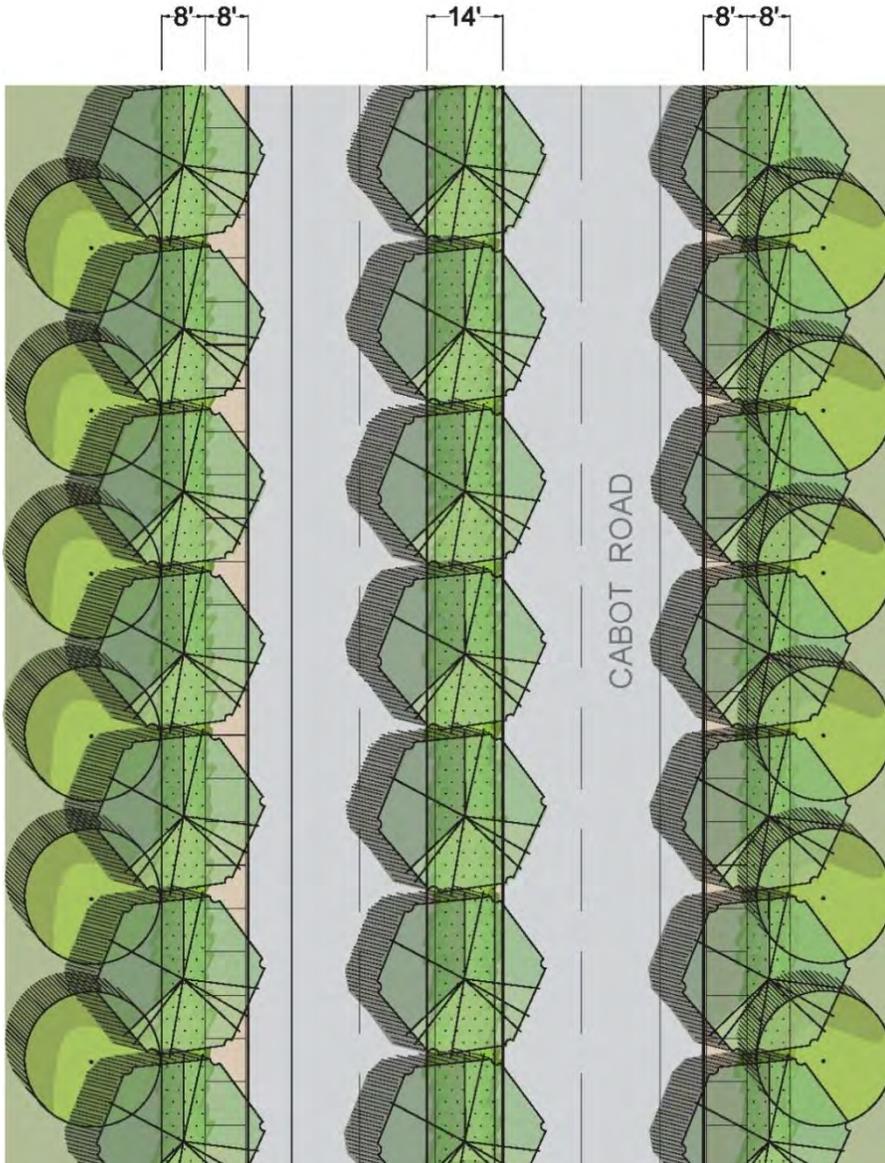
A Cabot Road: Typical Plan View, Character, and Plant Palette
